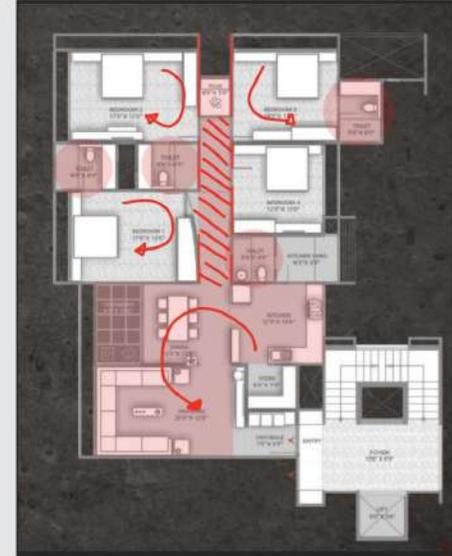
DeLano apartment, New York City, floor plan 1907-1963.
